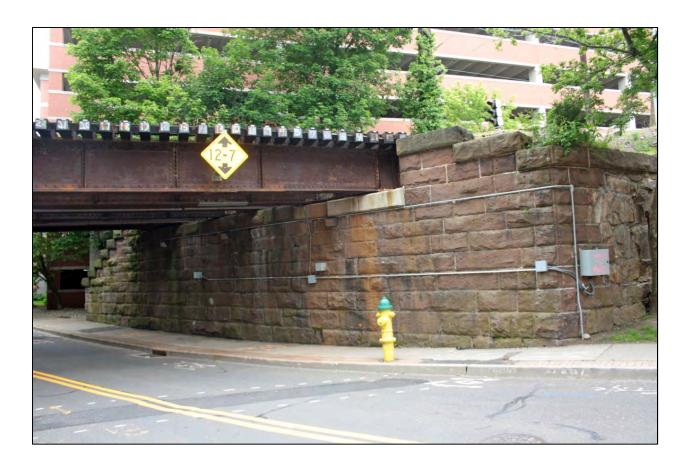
Ann Street Bridge, east side of bridge and south abutment, camera facing southwest.
